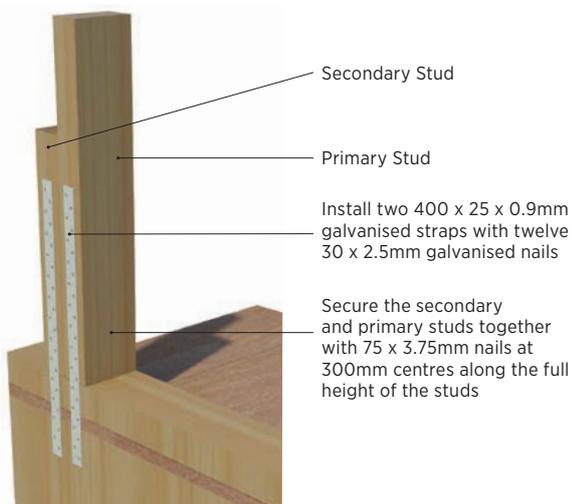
TOP PLATE CONNECTIONS IN BRACING ELEMENTS
